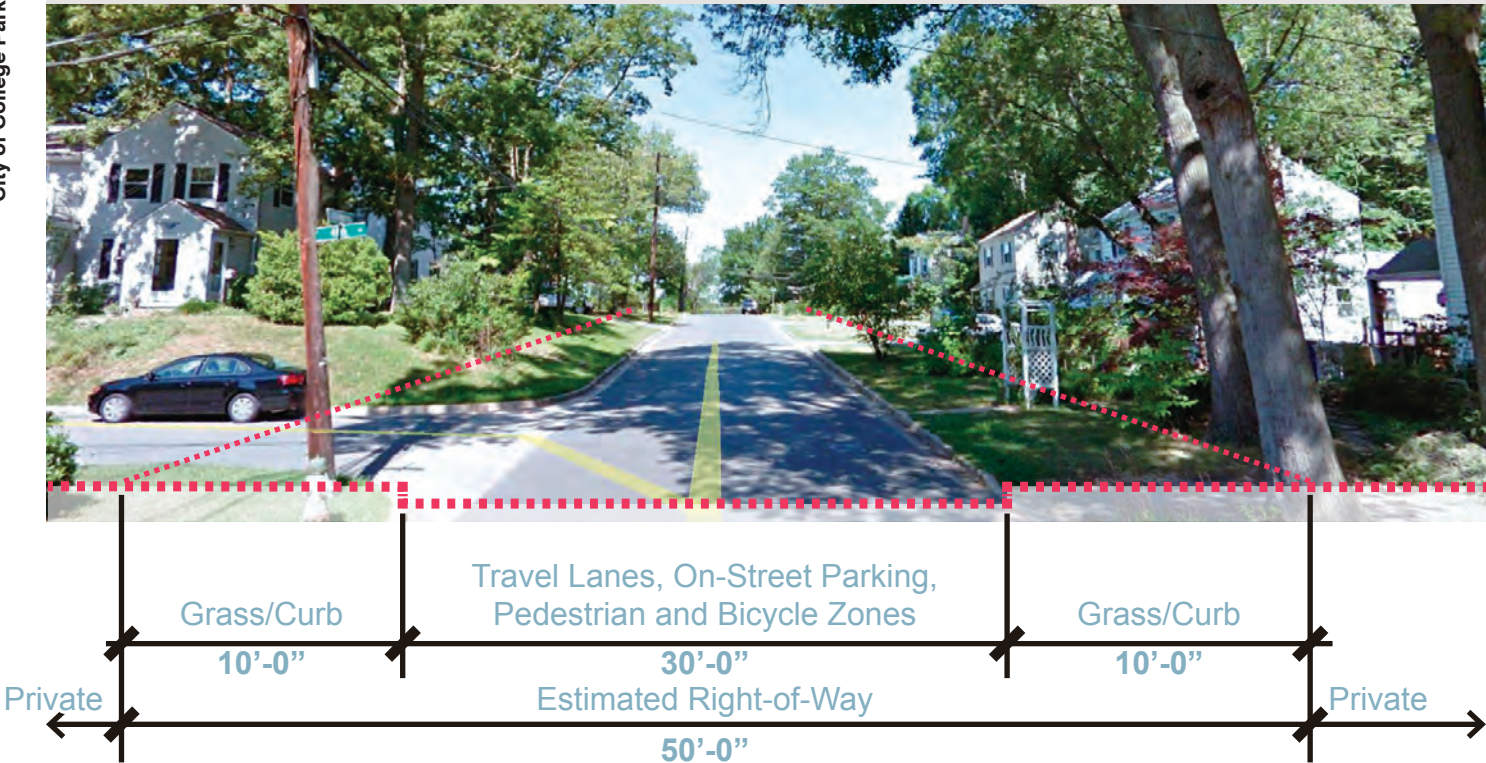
| GUILFORD ROAD (STREET VIEW AND SECTION)
